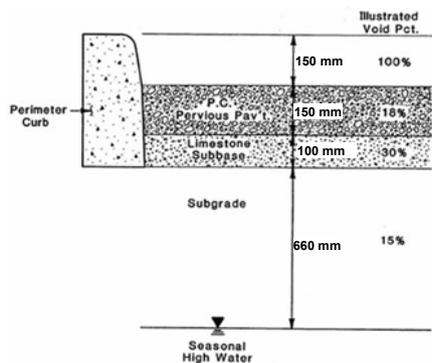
Schematic of a typical pervious concrete pavement section (Balogh 2005)
